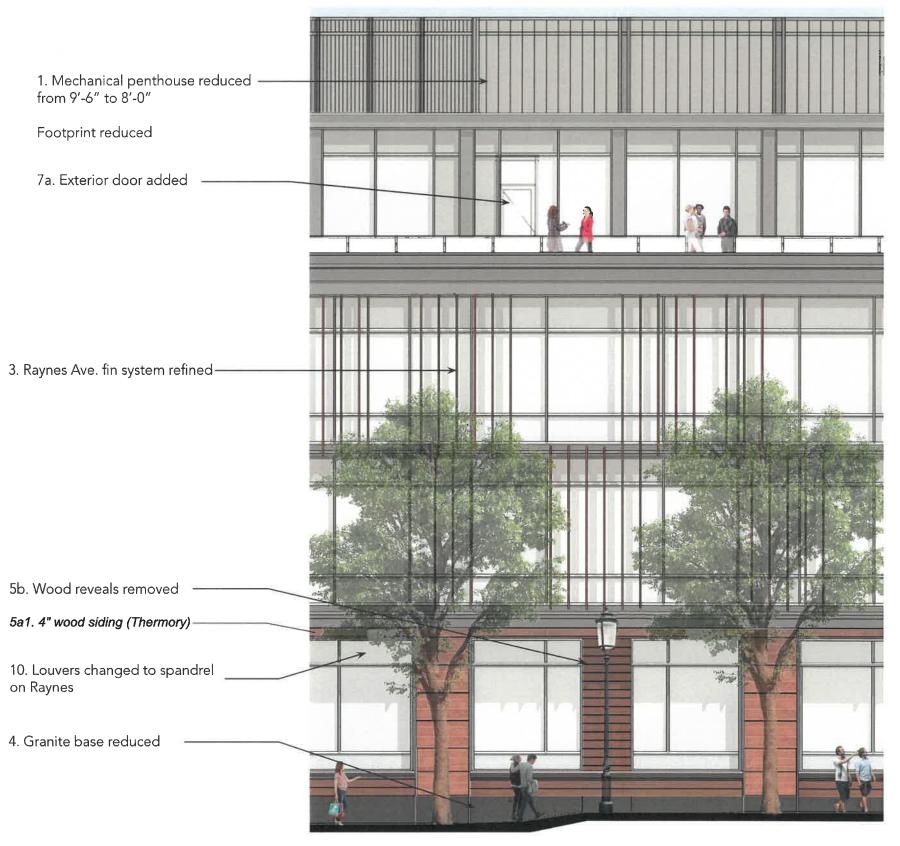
DETAIL ELEVATION - MAPLEWOOD FACADE 111 MAPLEWOOD AVE PORTSMOUTH, NH Revised Design 01-08-20
